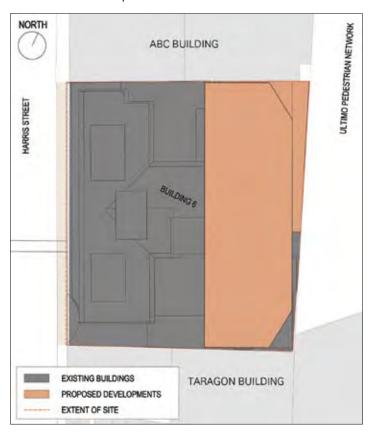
Footprint of Building 6 tower (Source: BVN / JBA)
